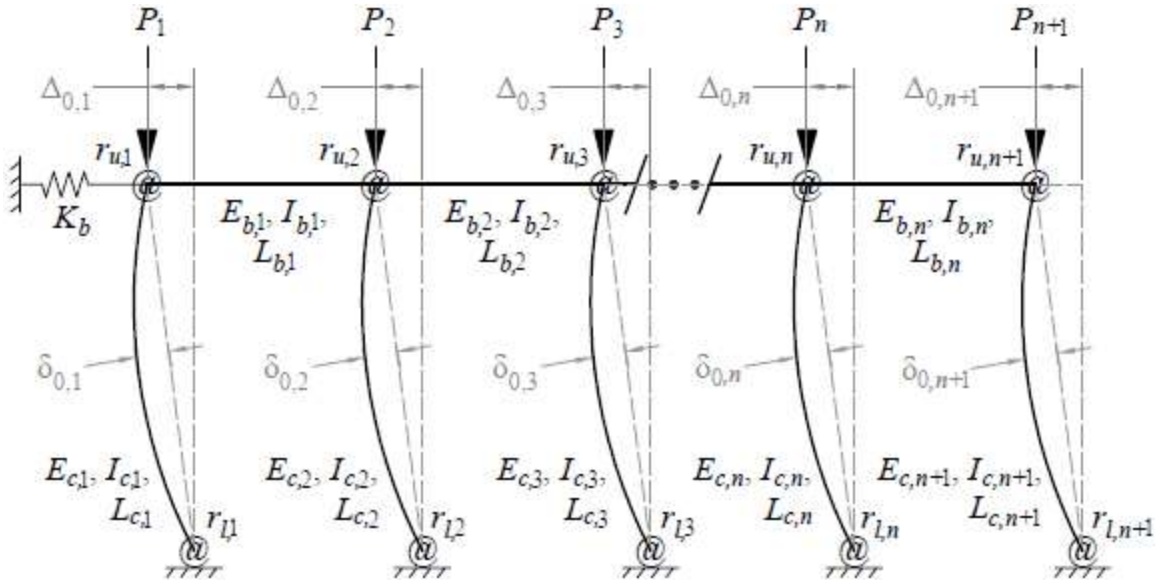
Semi-braced storey frame subjected to gravity loading and initial imperfections
